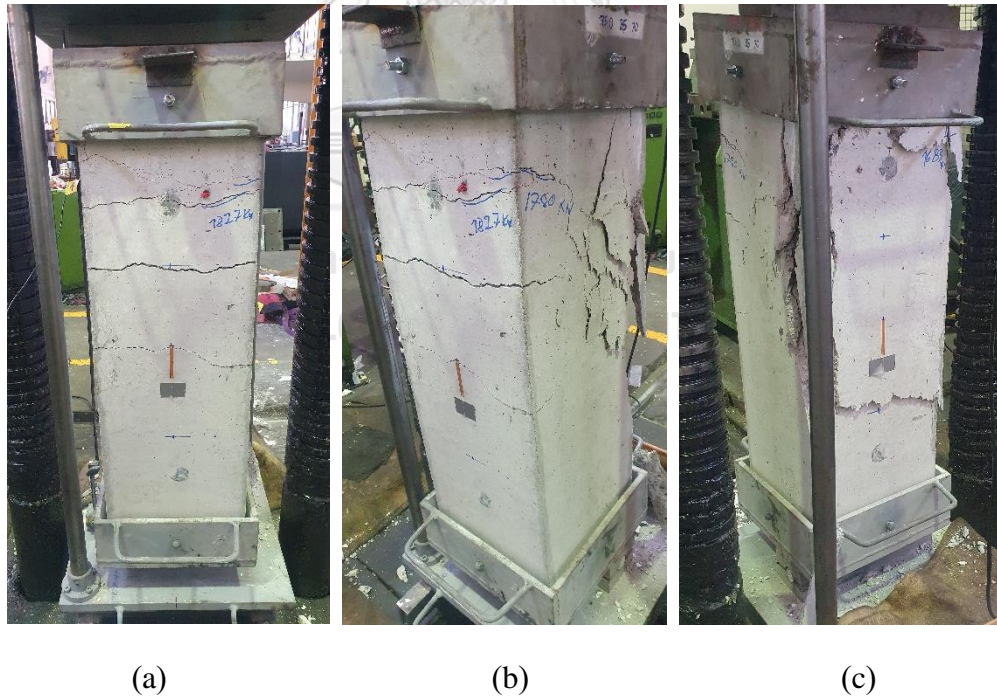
Failure of CECS column C2s-63-E2; (a) tension side; (b) side view; and (c) compression side.
